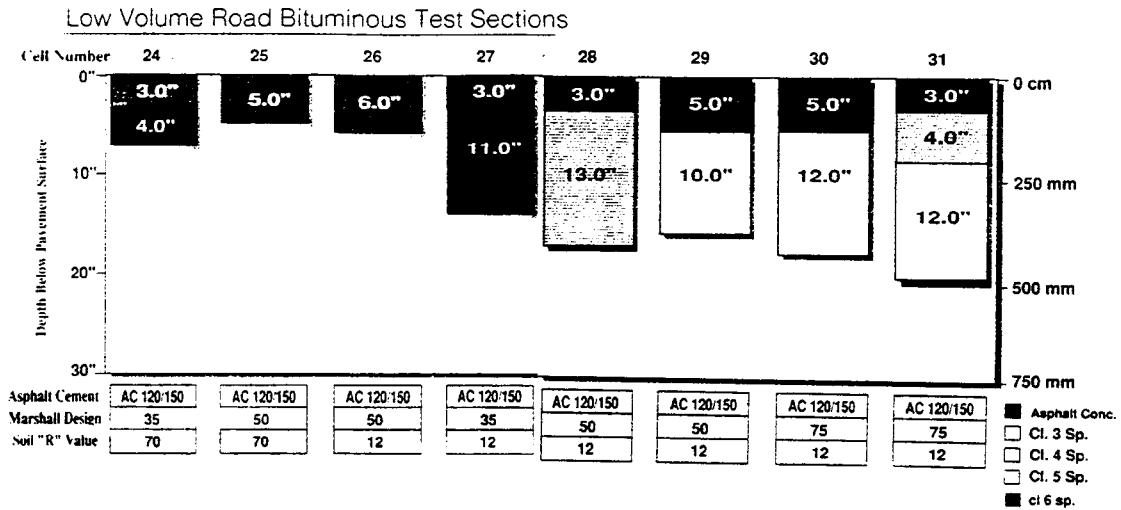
Layout for the Low Volume Road Asphalt Concrete Test Cells.
